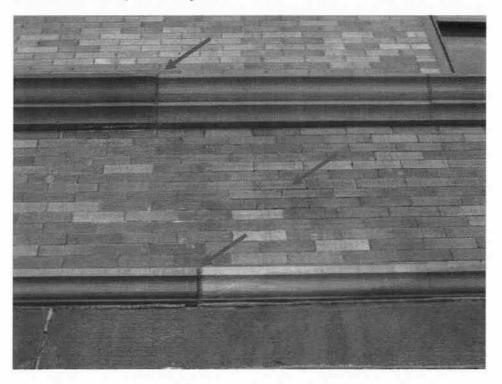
South façade brick spandrel and sandstone horizontal bands – typical area of open mortar joints at brick spandrel areas and occasionally cracked and open mortar joints at sandstone bands.
